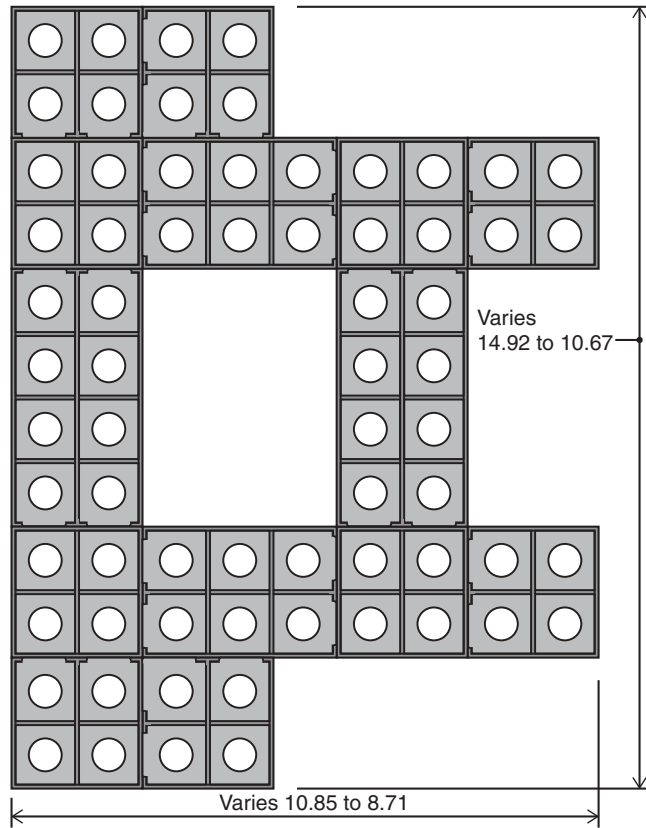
Cross section of a welded pylon with moderate dimensions
